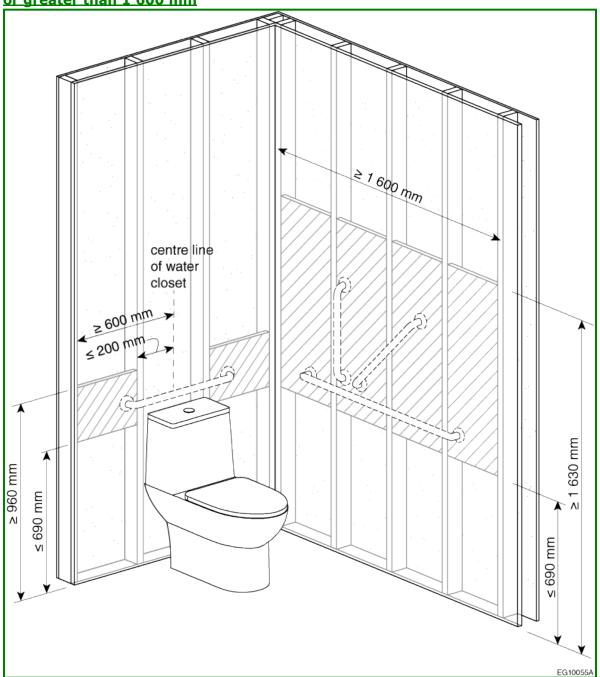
(2) illustrates an example of an acceptable configuration for the reinforcement of stud walls around a water closet. Possible grab bar configurations are also shown.
